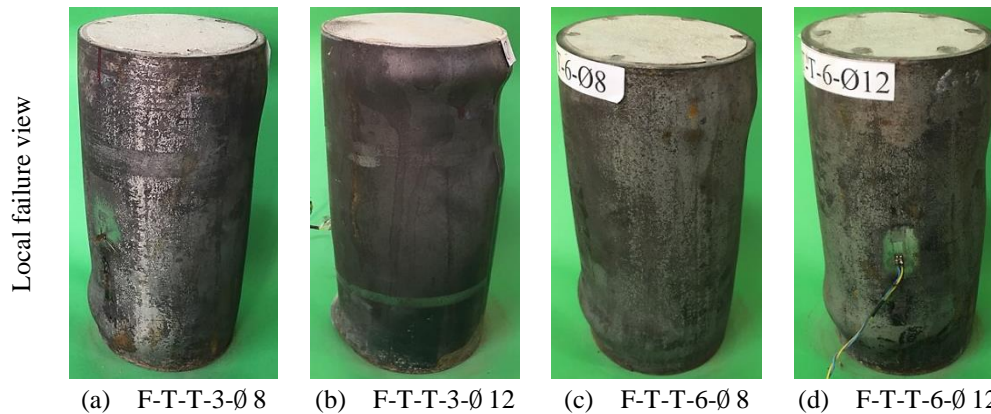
Failure modes of column specimens with 5.63 mm wall thickness exposed to the smouldering fire test after compression loading
